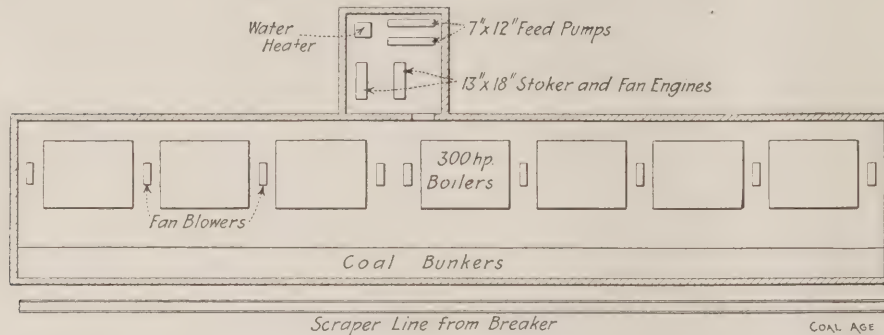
SKETCH PLAN SHOWING LAYOUT OF BOILER HOUSE
